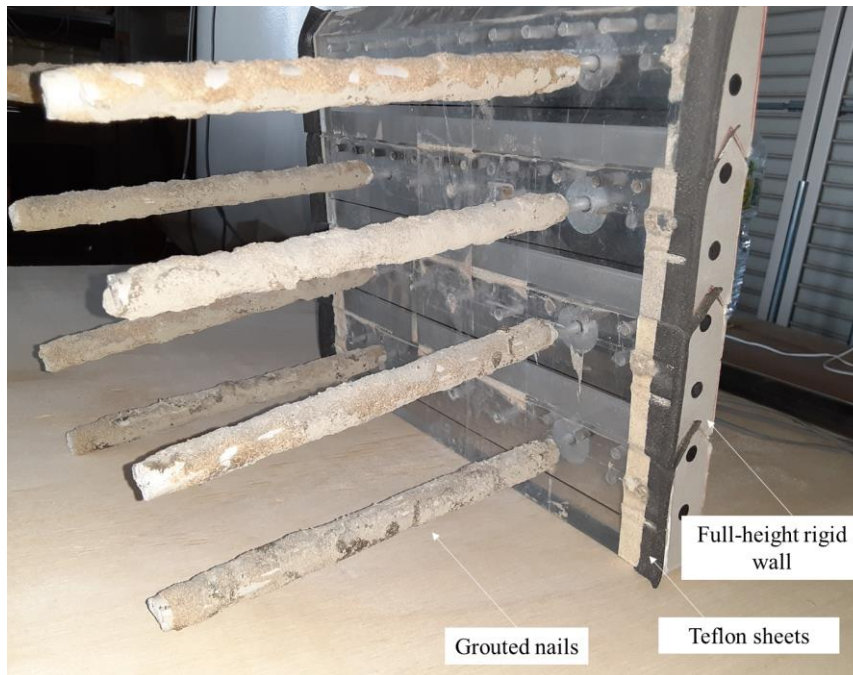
(b) Reinforcement material (Soil nails) for the soil nailed walls
